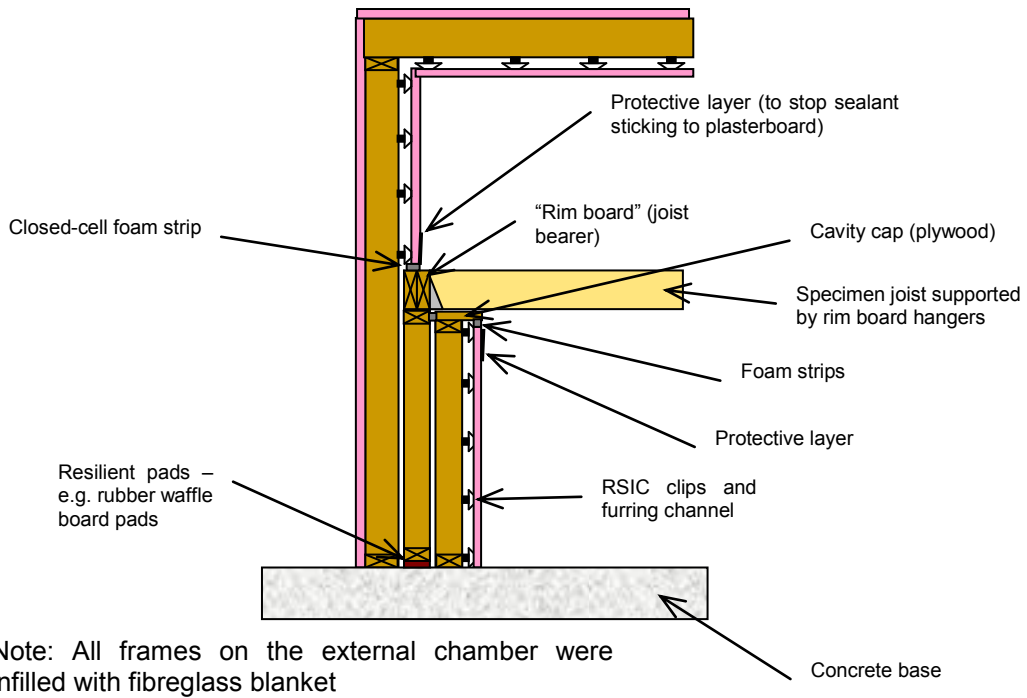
Elevation view of end of chambers – section Y-Y (not to scale)
